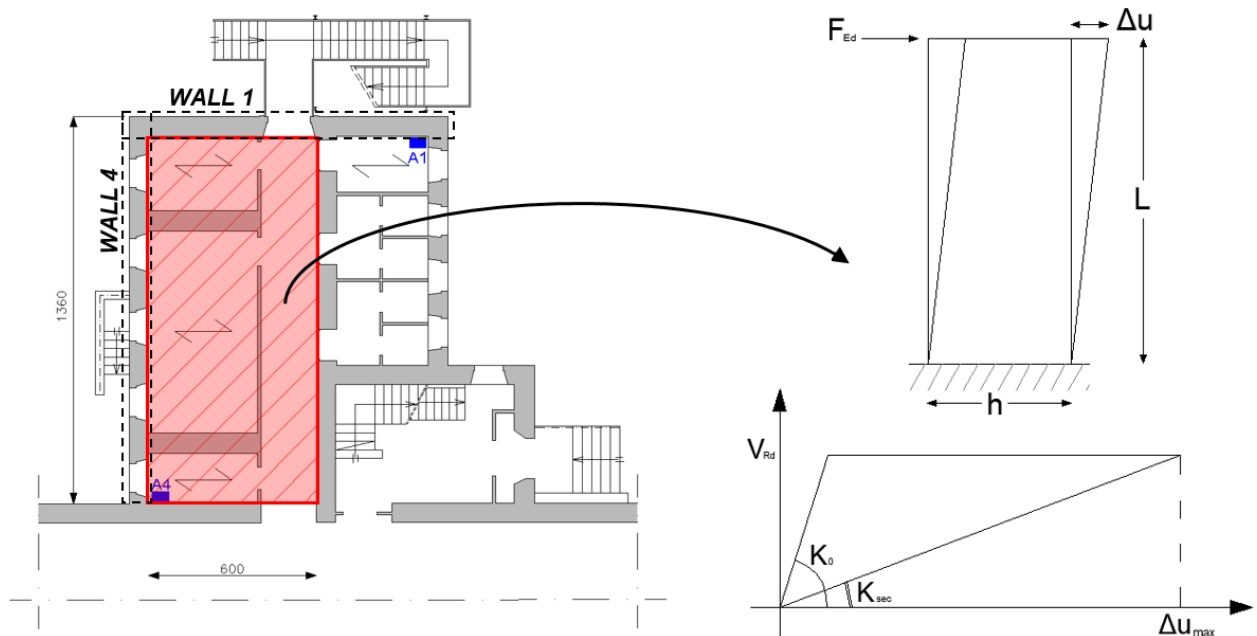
Simplified cantilever scheme for evaluating the secant stiffness of wing “B” diaphragms.
